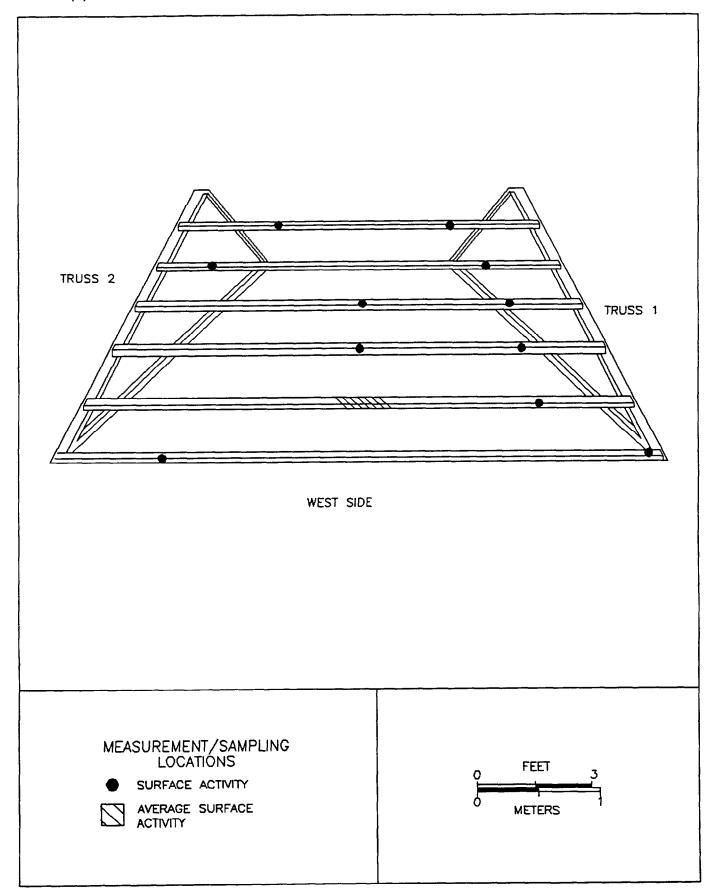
Building 3, Bay 1, West - Measurement and Sampling Locations
